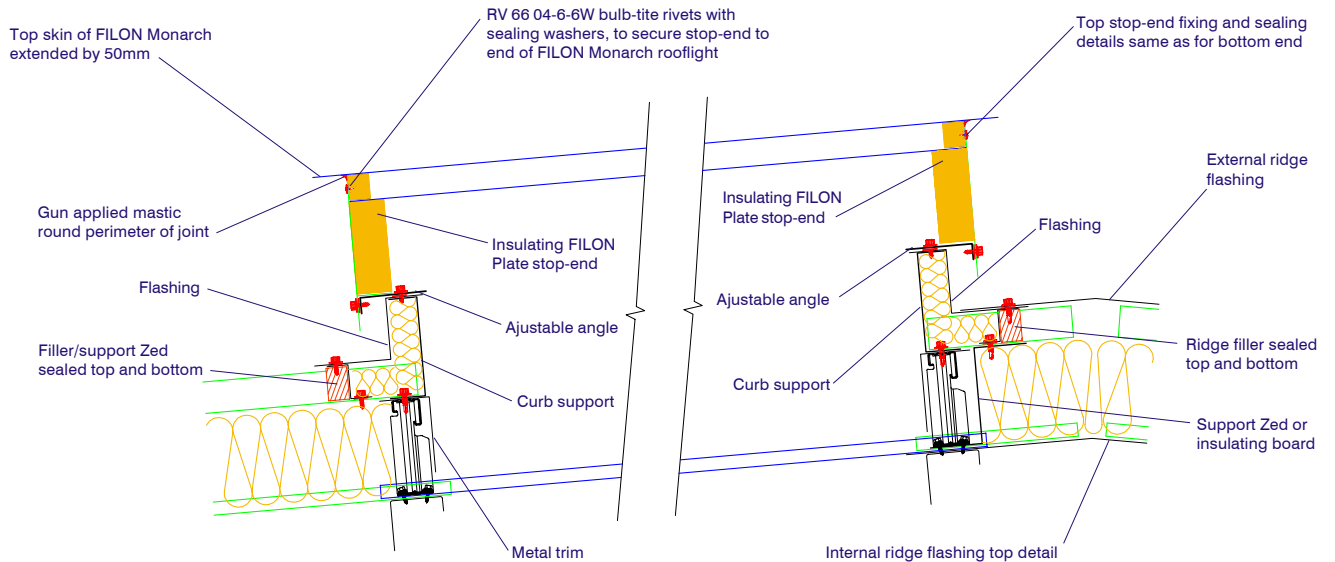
FILON Monarch Barrel Light - Longitudinal Section (typical)
